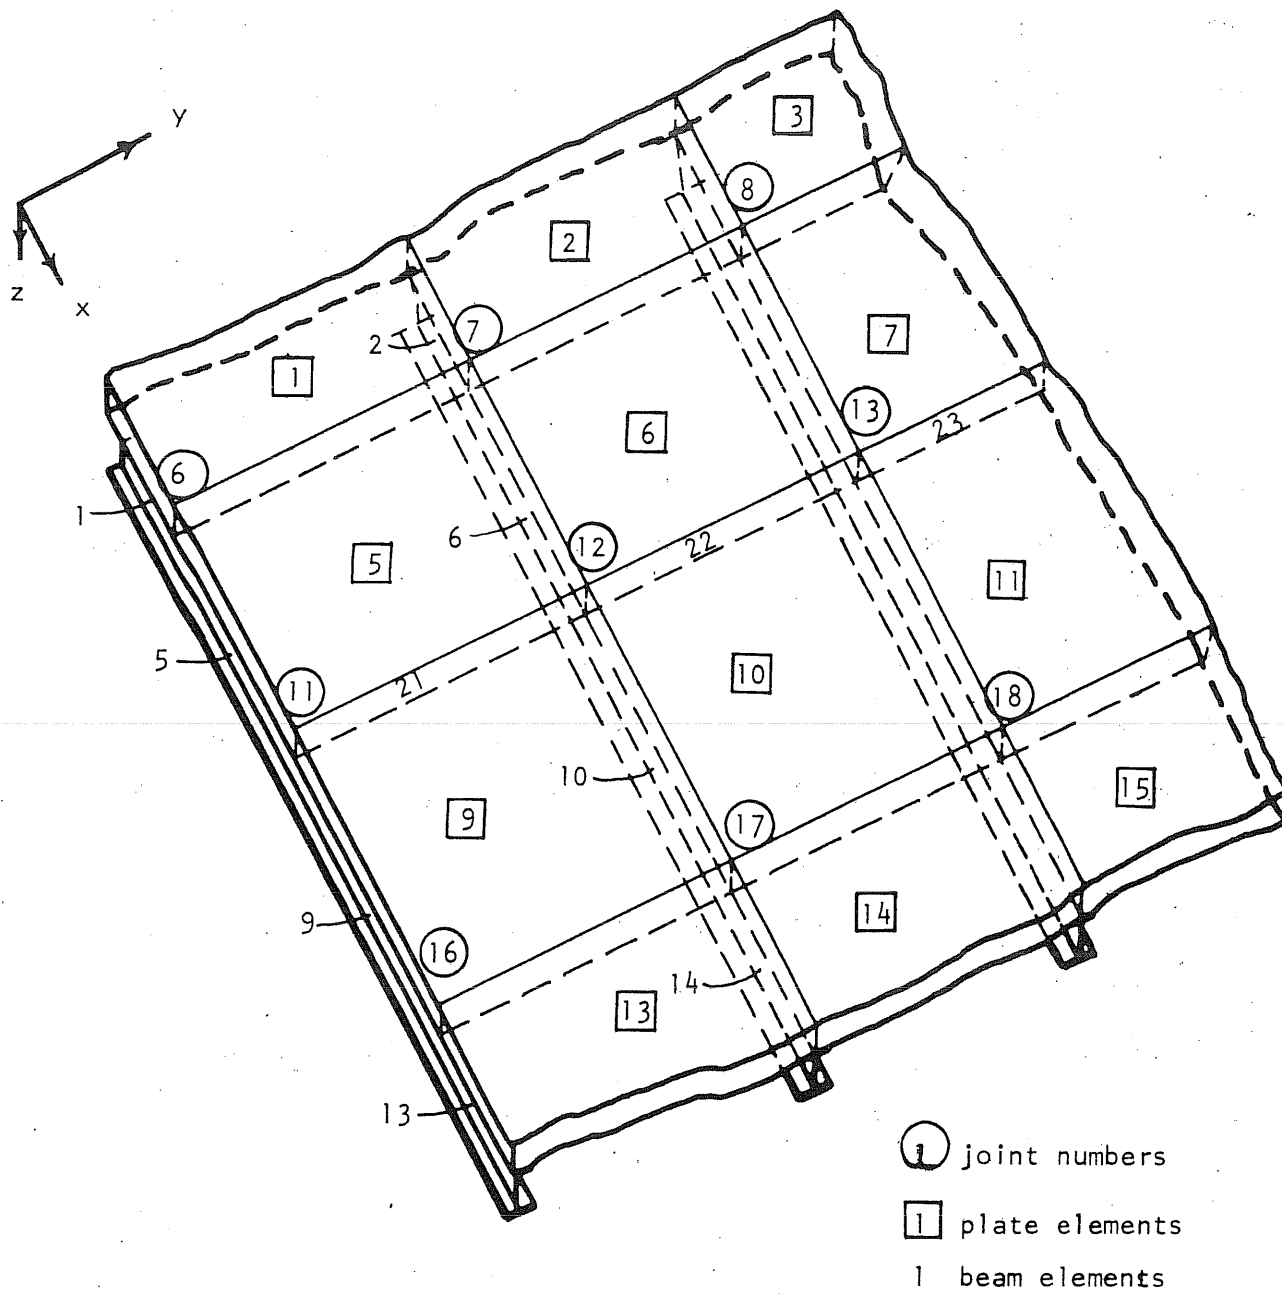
SECTION FROM A TYPICAL BRIDGE MODEL
